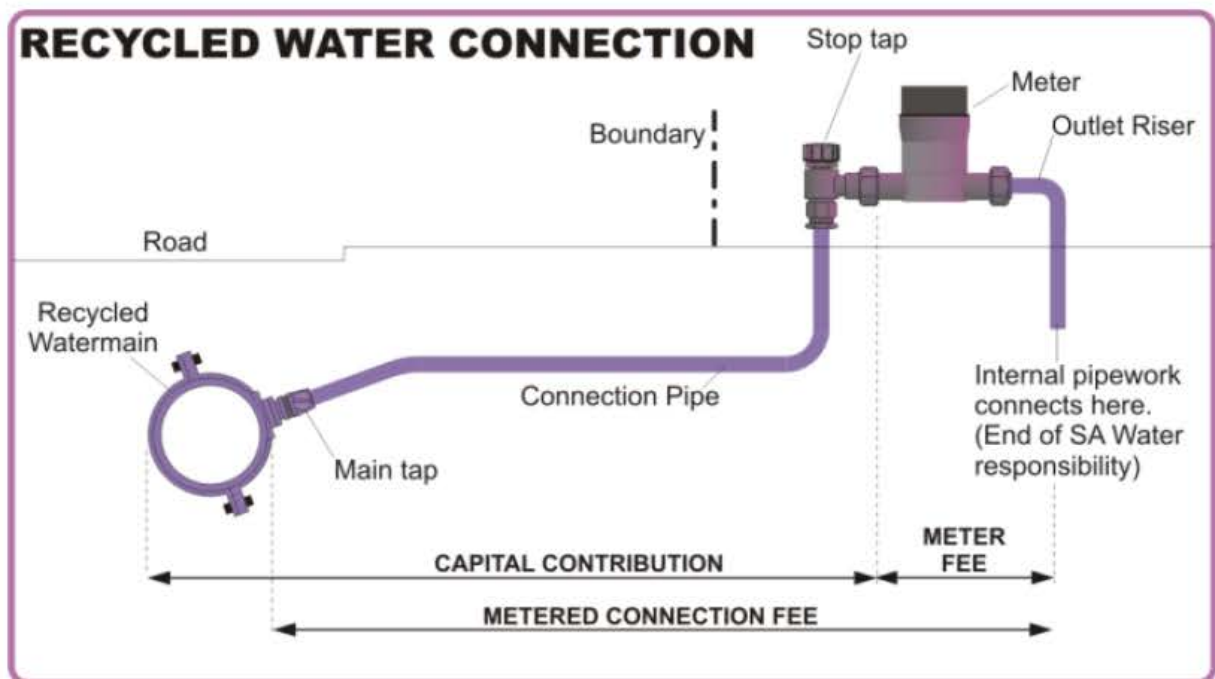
Typical non-drinking water meter above-ground installations (Source – SA Water Metered Recycled Water Connection Fact Sheet)
